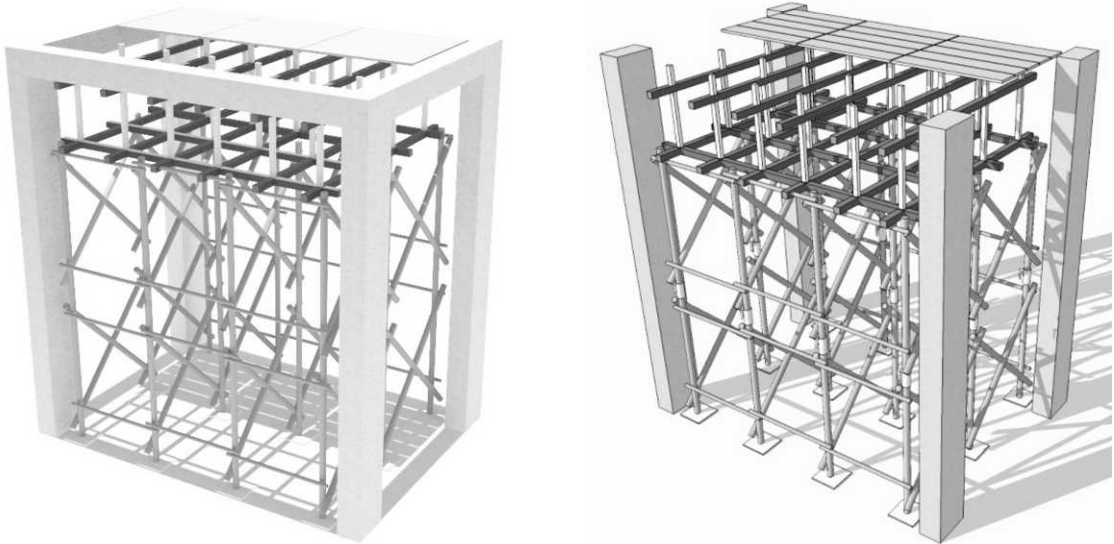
Typical High Clearance Scaffold System Arrangement.
